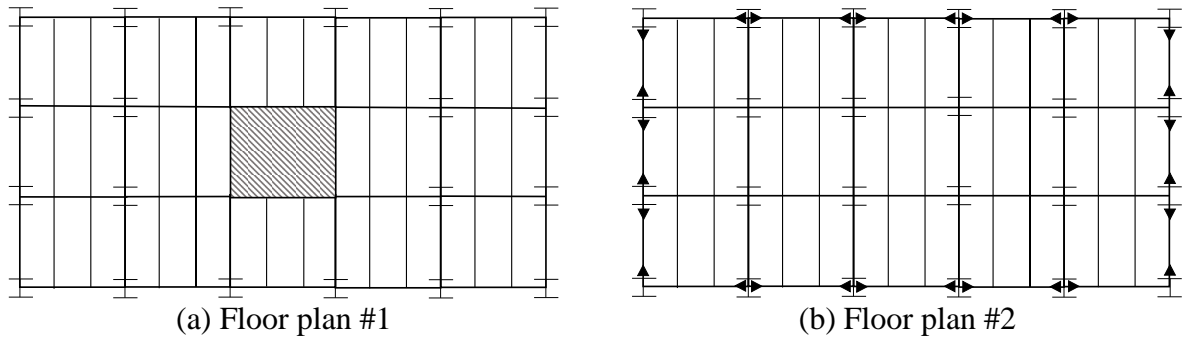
Floor plan of the steel-concrete composite buildings examined: (1) floor plan #1 with an interior rigid core; and (b) floor plan #2 with exterior moment resisting frames. Triangle markers represent rigid beam connections.
